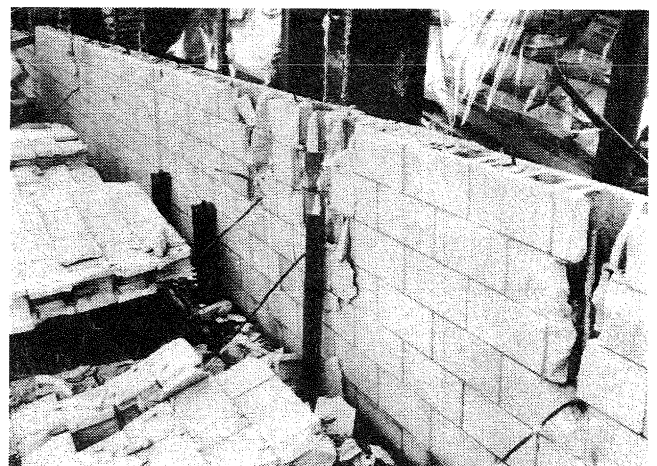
Collapsed fire wall. Note spacing of reinforcing and incomplete grouting of reinforced cells.
